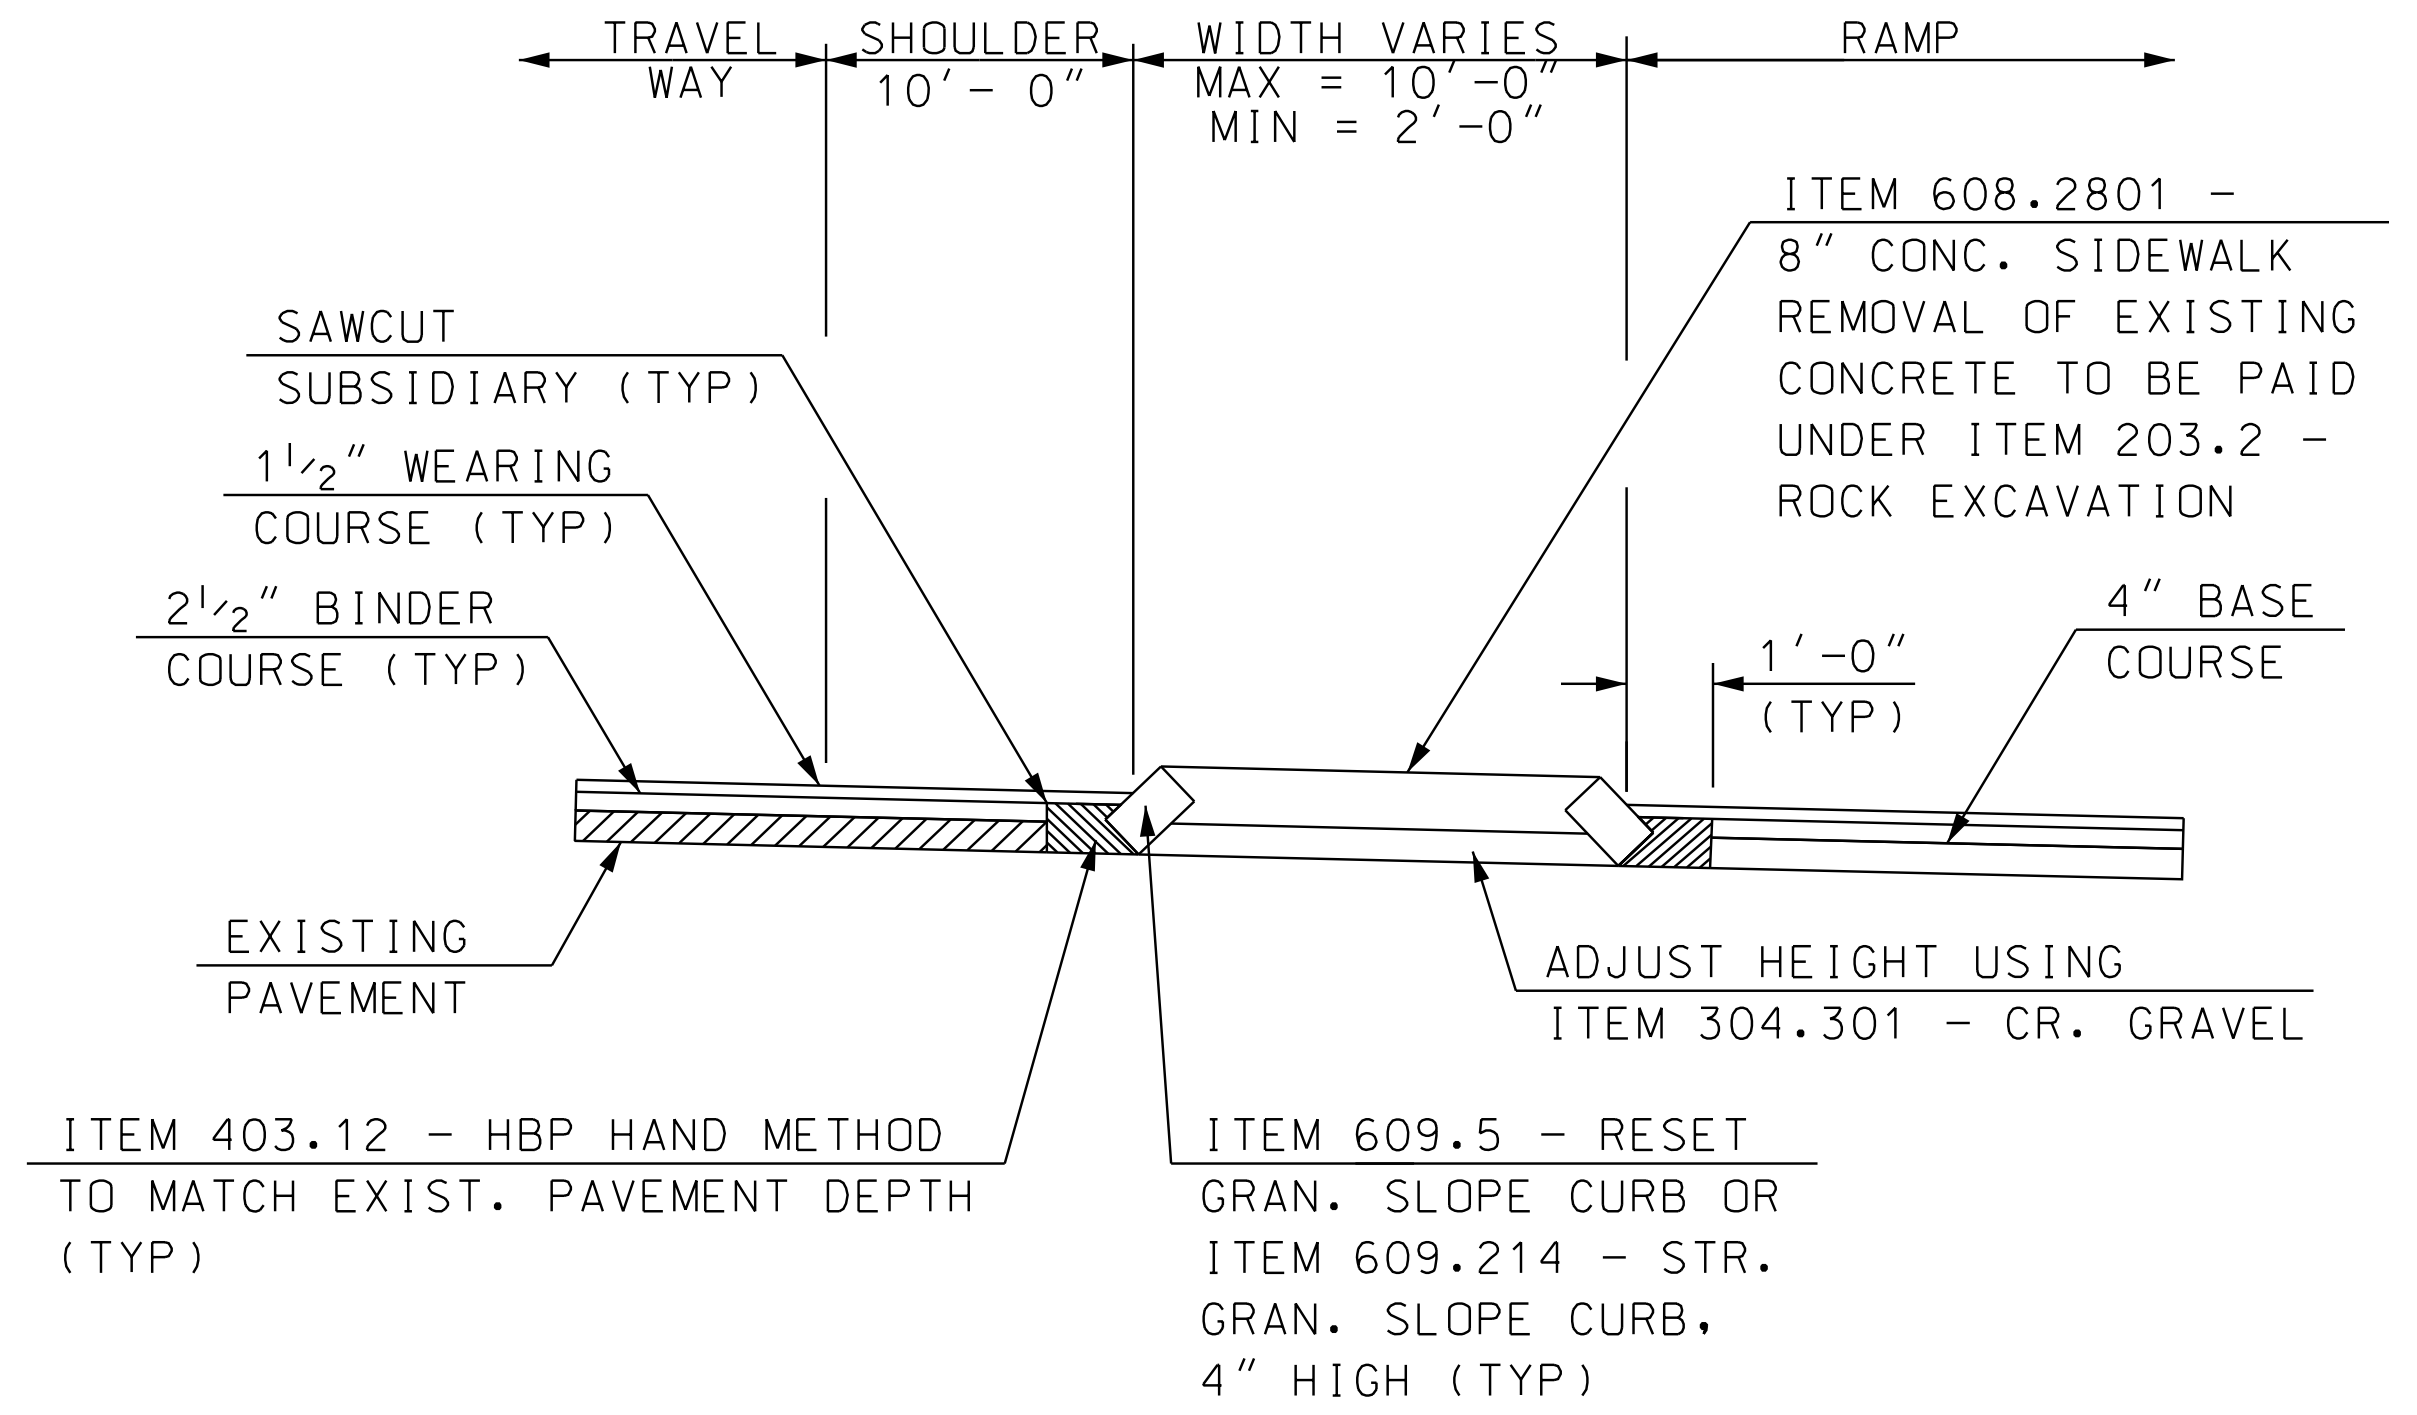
" CONCRETE SIDEWALK AND CURBING
